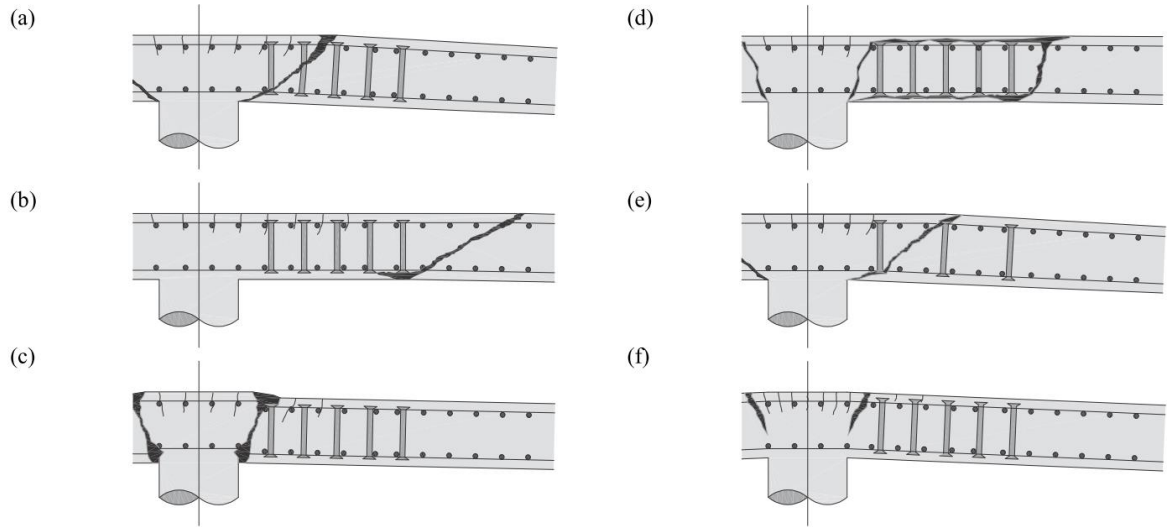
Possible failure modes of slabs with shear reinforcement: (a) failure within shear-reinforced area, (b) failure outside shear-reinforced area, (c) failure close to the column due to crushing of concrete, (d) delamination of the concrete core, (e) failure between the transverse reinforcement, and (f) flexural failure. [38]
